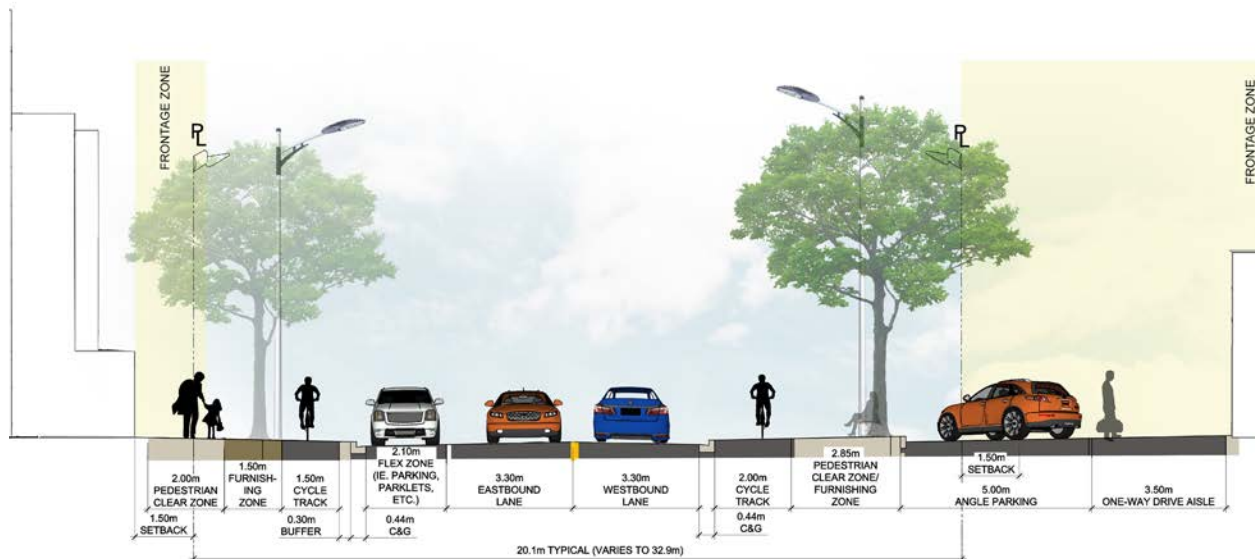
THE CORE (45 STREET TO 46 STREET N.W.) SECTION - INTERIM
